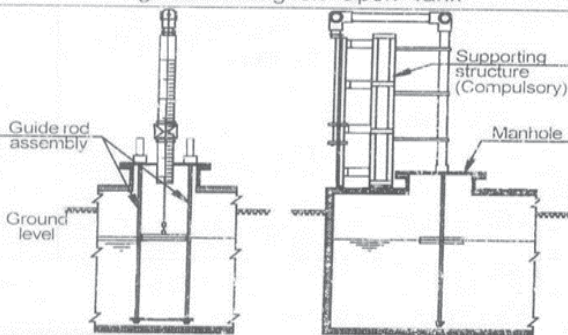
Top of Tank Mounting with Guide Rod Assembly
